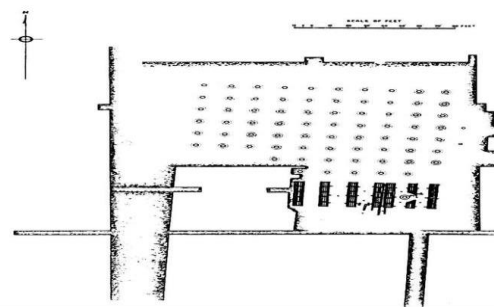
Plan of the *Mauryan* 80 pillared Hall (Spooner D. B., 1912-1913).
